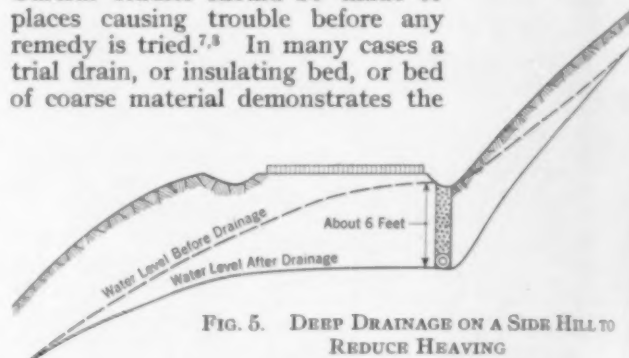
DEEP DRAINAGE ON A SIDE HILL TO REDUCE HEAVING
